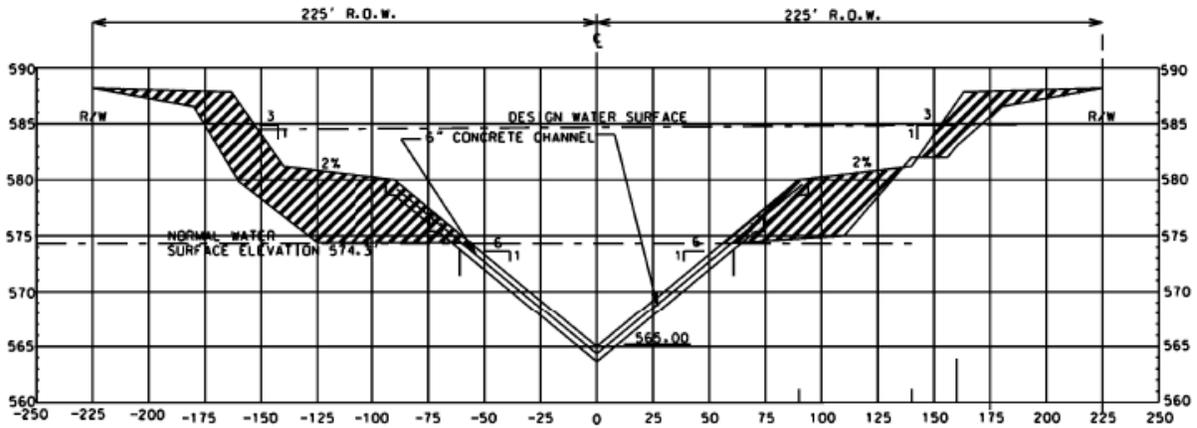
Partial Concrete Removal and Construction of Floodplains.
